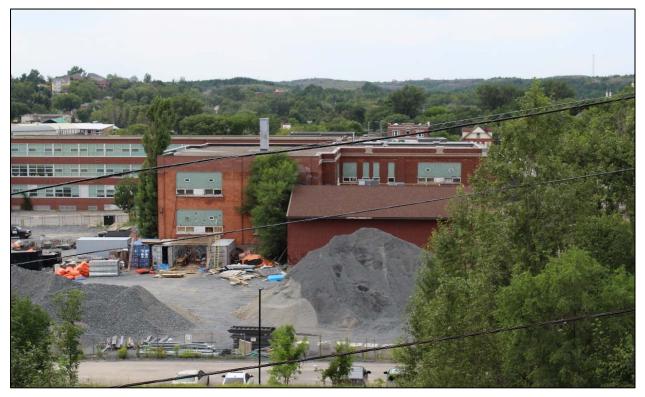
View of 162 MacKenzie Street, east elevation (Source: ML 2020).
